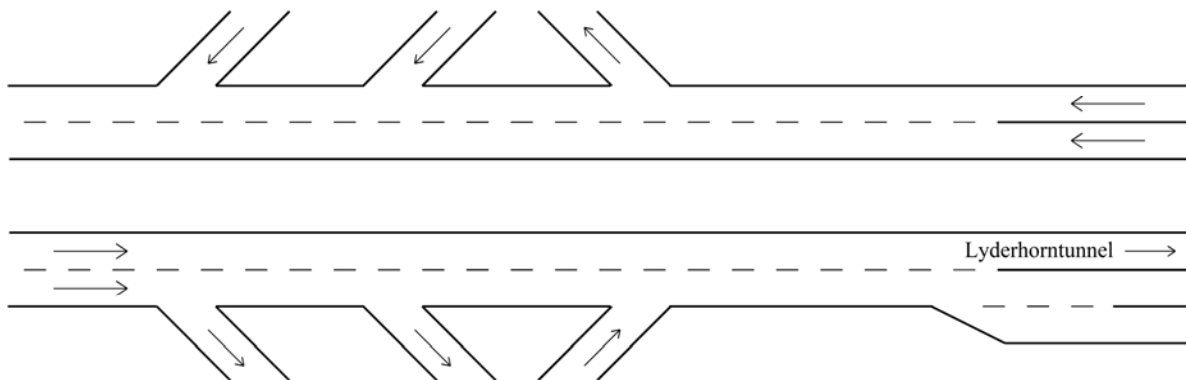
The Knappetunnel with slip road leading to the Lyderhorntunnel.
